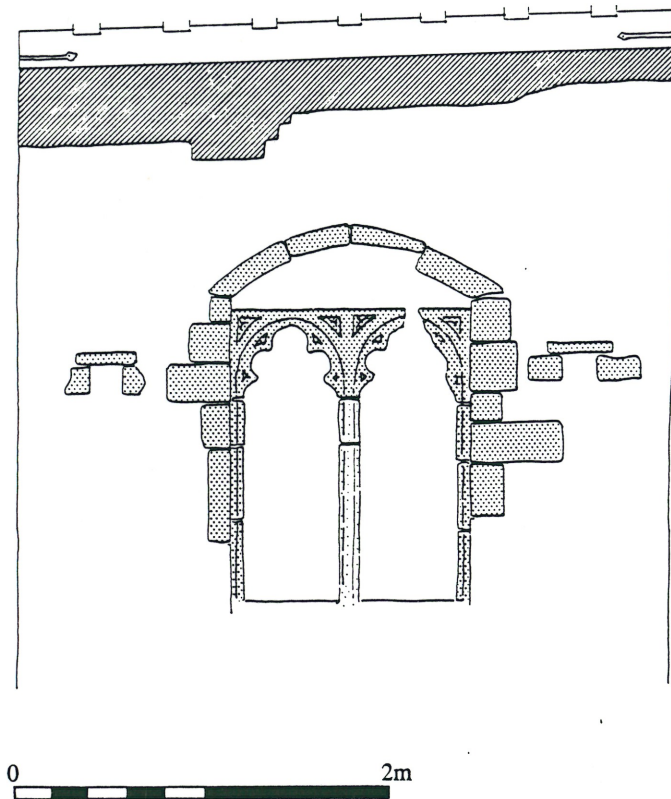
North wall internal elevation (Drawing by A. Baggs)
